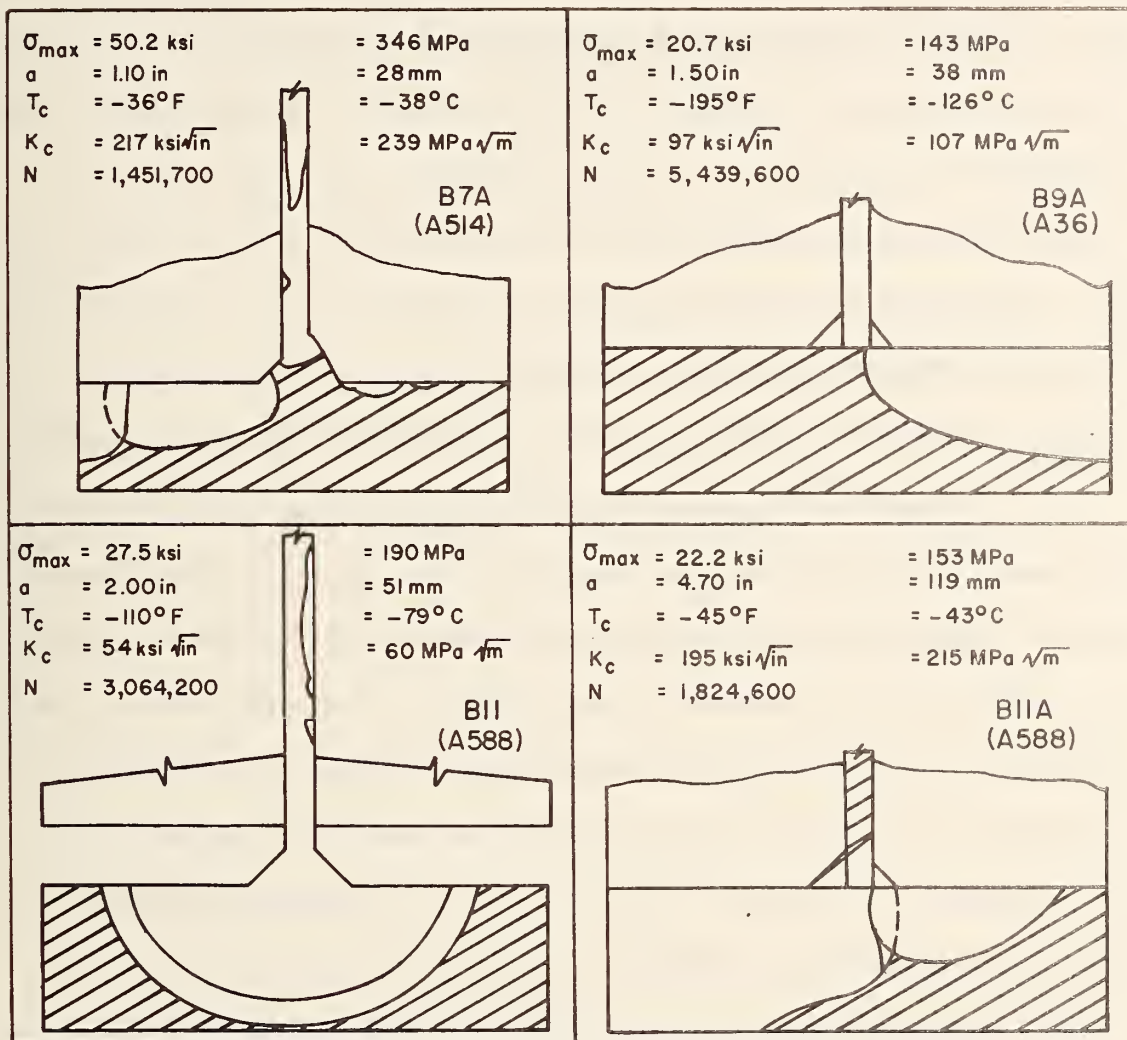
Fracture Surface Sketches and Data Summary
